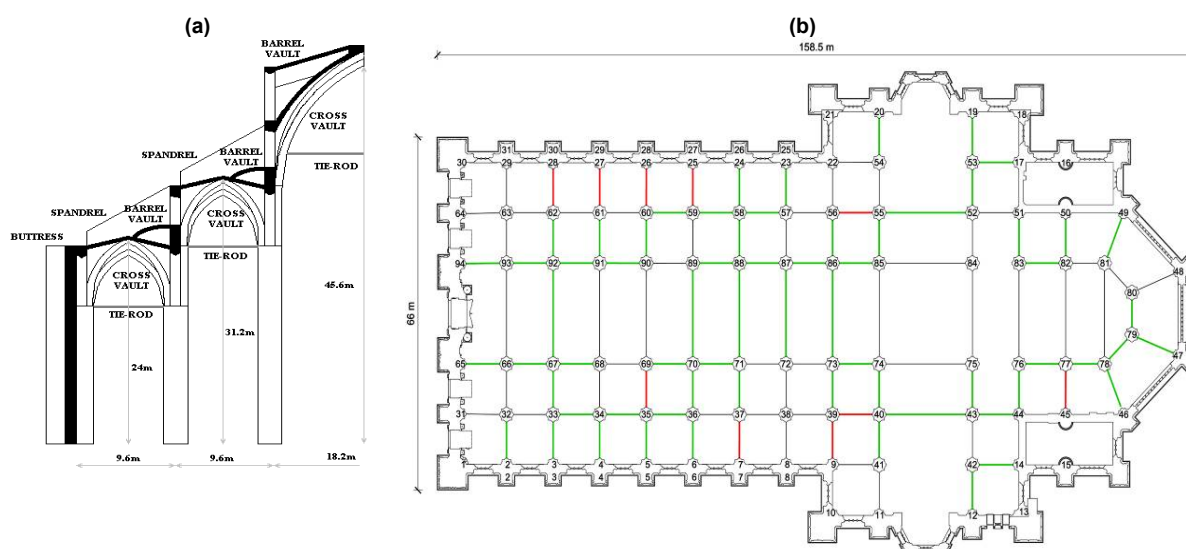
Milan Cathedral: (a) Structural system exemplified on half transversal cross-section; (b) Plan of the church and schematic of the metallic tie-rods (with green and red colors referring to the structural elements assessed in 2012-2014).
